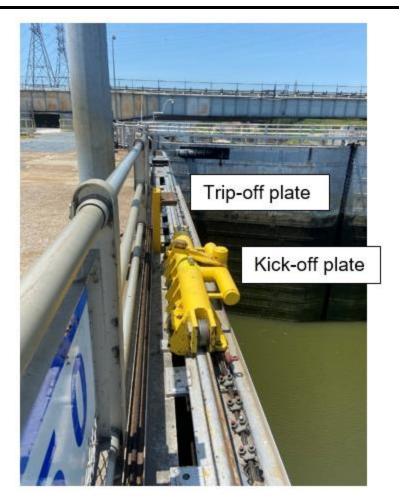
Existing Kentucky Lock – towing bitt kick-off plate and trip-off plate
